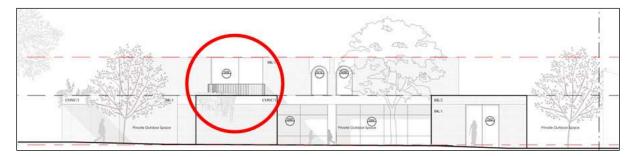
terrace on the east façade overlooking 6 Cadogan Crescent
